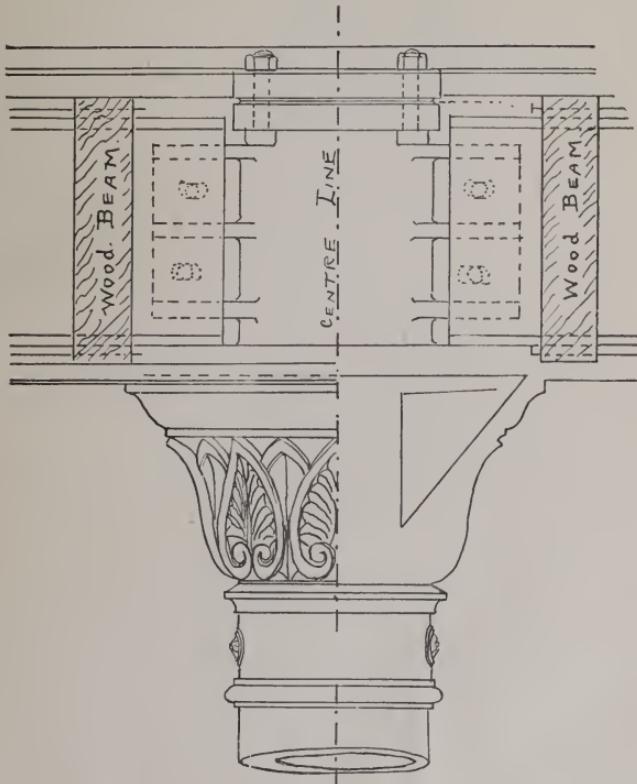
LONGITUDINAL SECTION OF FLOOR.
